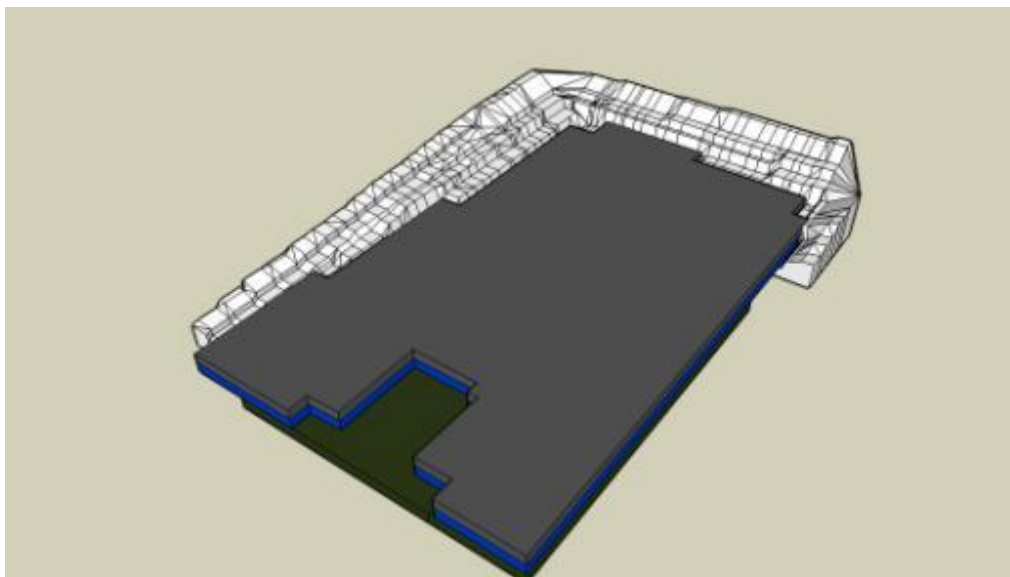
3-D model showing layout of basement floors superimposed onto soil nail slope.
